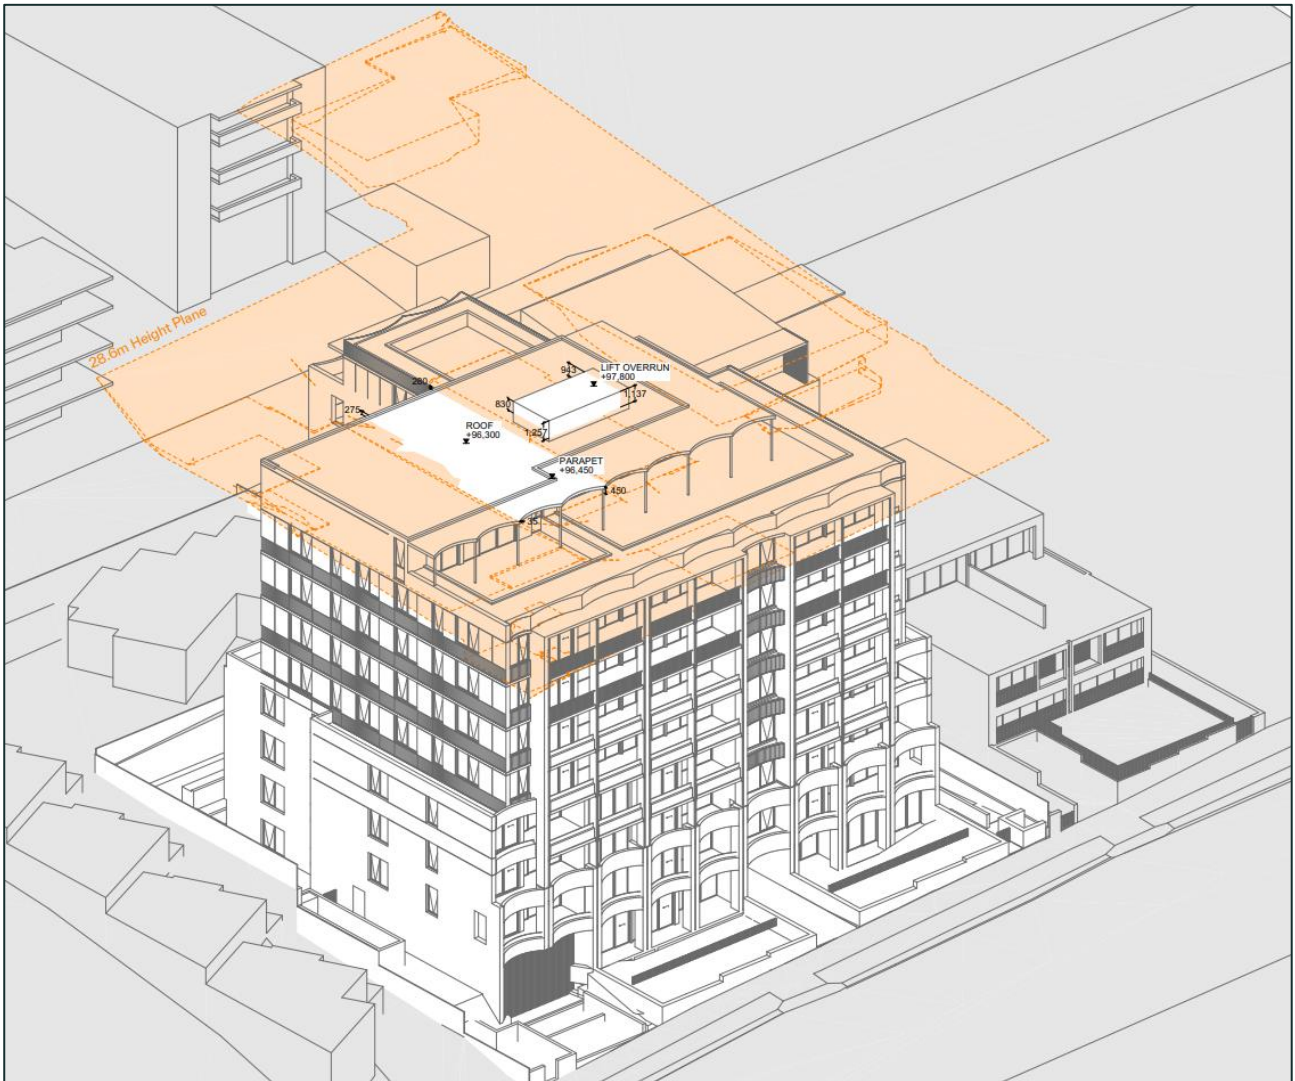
Height Plane and Building Height Details (Source: PBD Architects)
